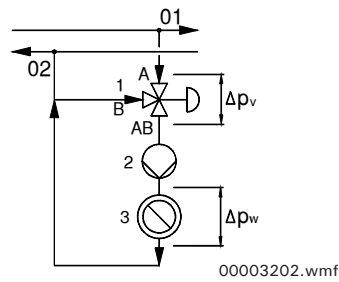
mixing valve (2 ins, 1 out) secondary circuit with pump
